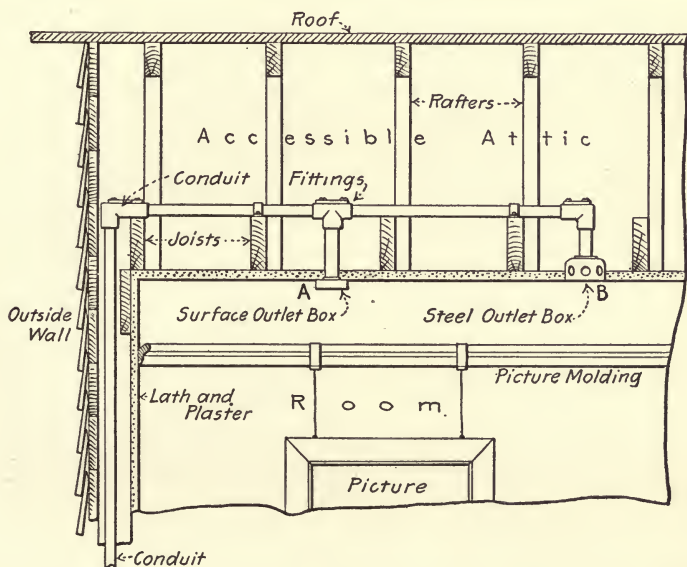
Installation of concealed conduit where the conduit run is available.
